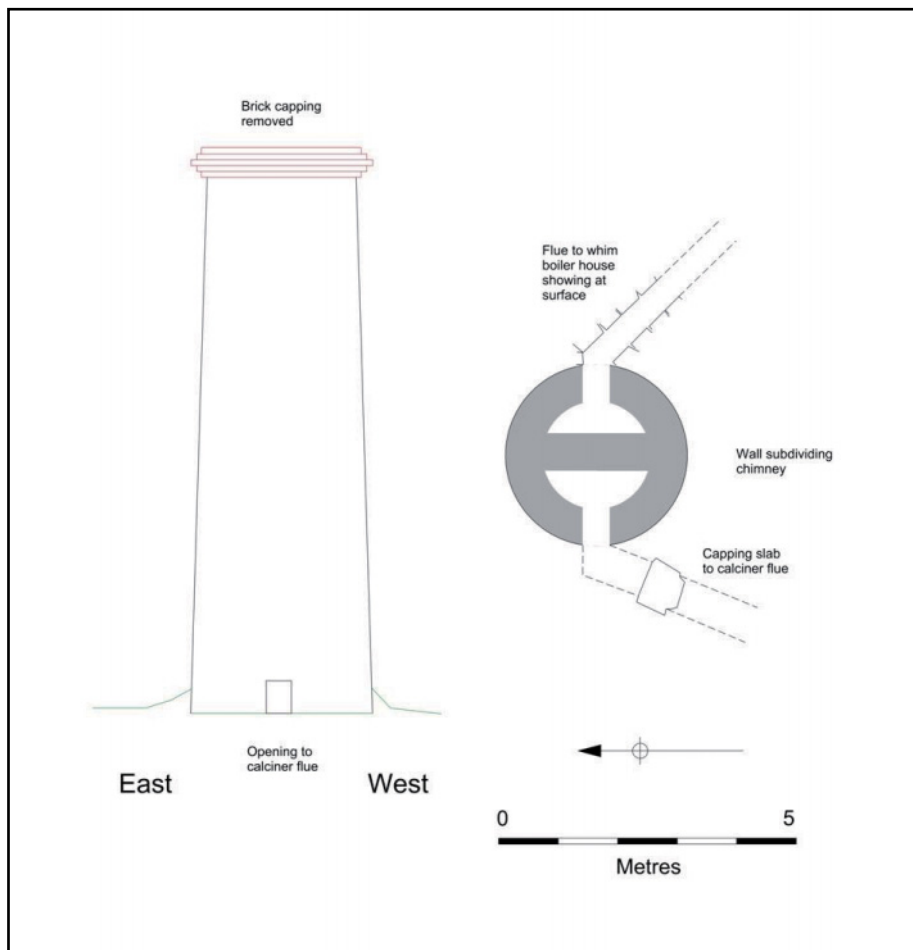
Wheal Coates chimney [190373] sample elevation and plan.
